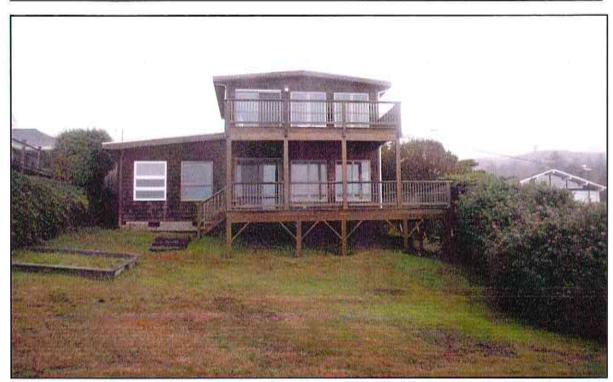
Western elevation view of existing home at 80258 Pacific Road. Proposed home addition will extend west from the existing structure, with proposed deck extending west from home.
